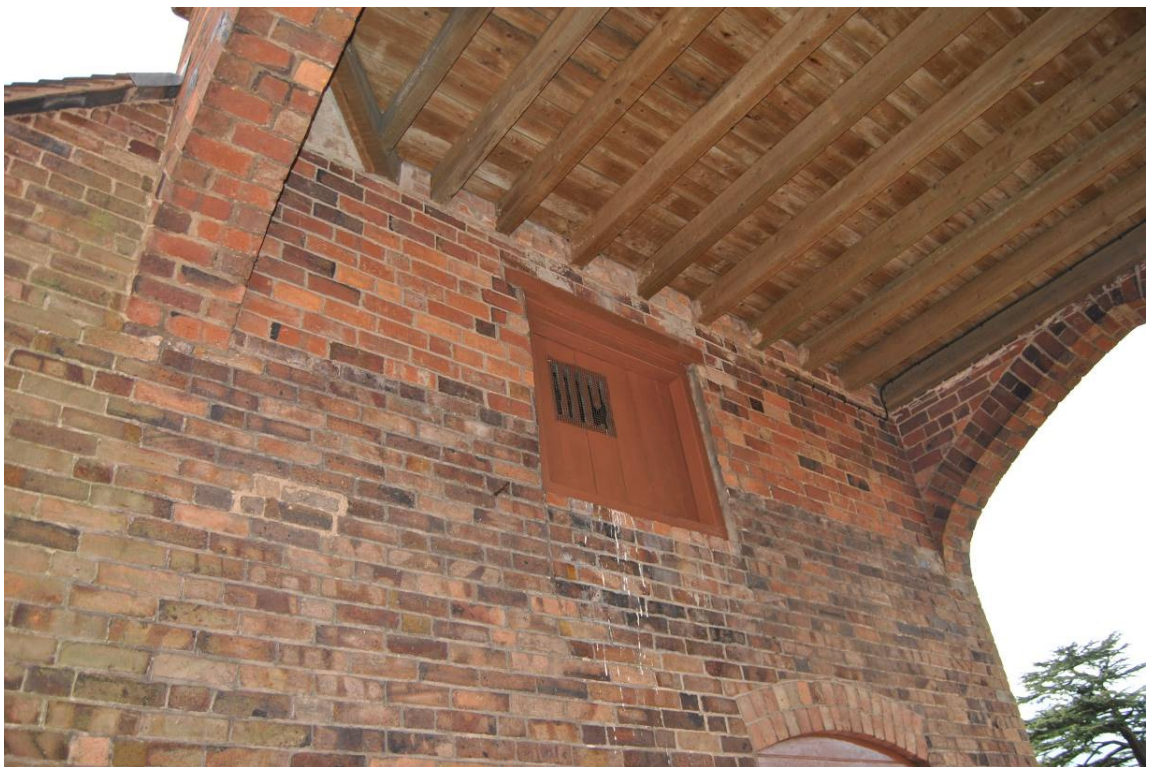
Distinction in brickwork of upper wall flanking west side of through-passage indicating raising of former hip-roofed coach-house. (NB. trimmer for 1F fireplace to SW angle).
